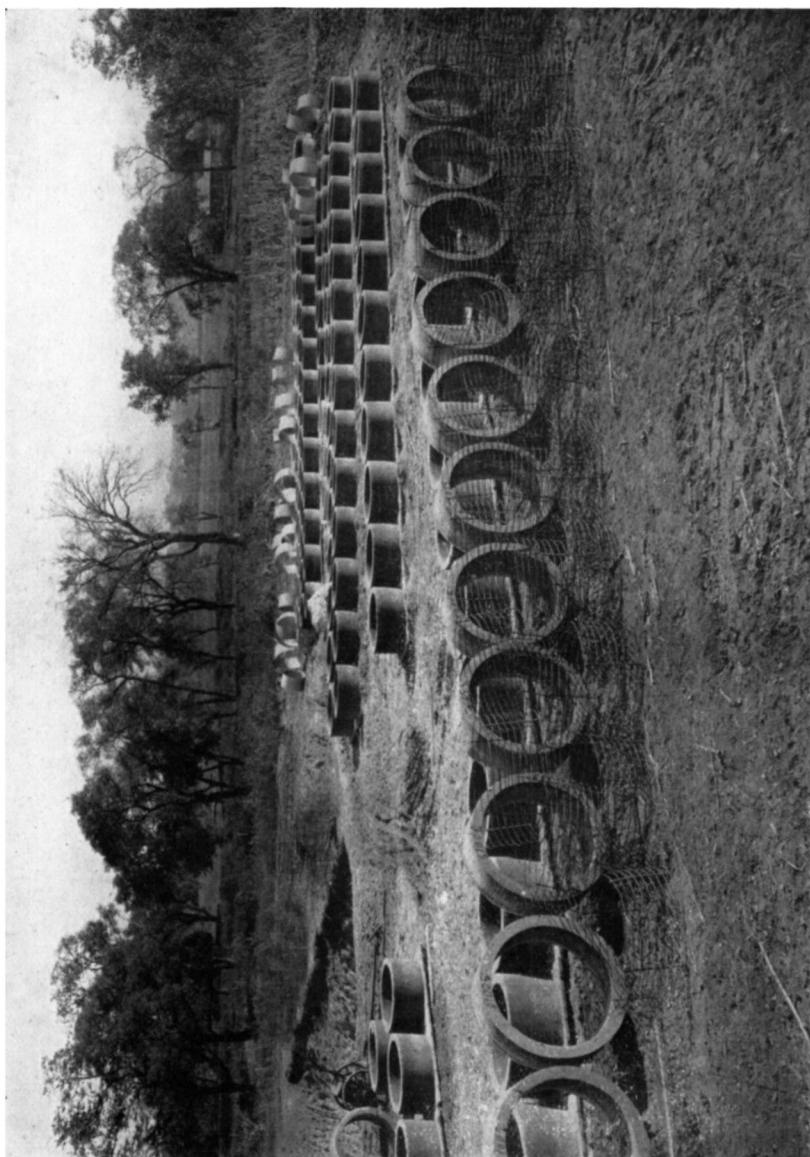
YARD WHERE 4-Foot REINFORCED CONCRETE RINGS WERE MADE
